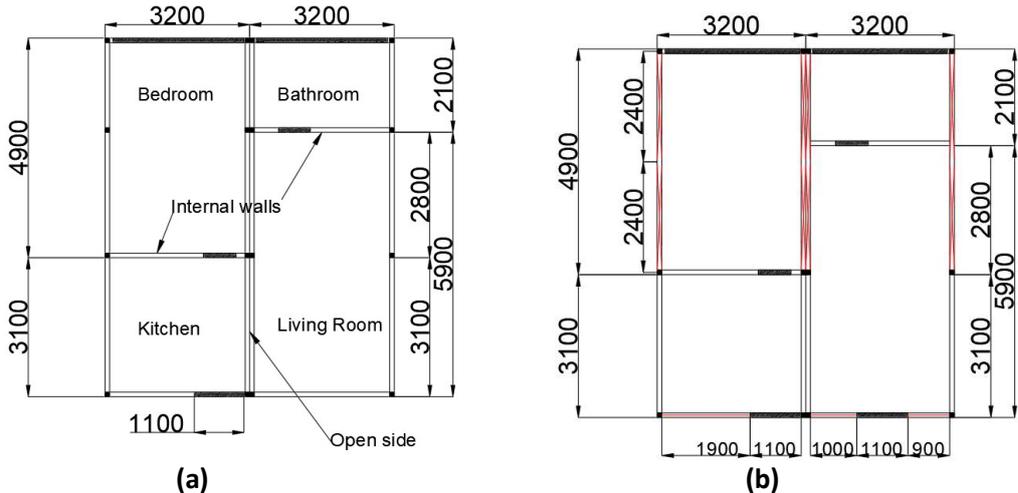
Murray Grove floor plans: (a) Functional, (b) Structural (own work)
